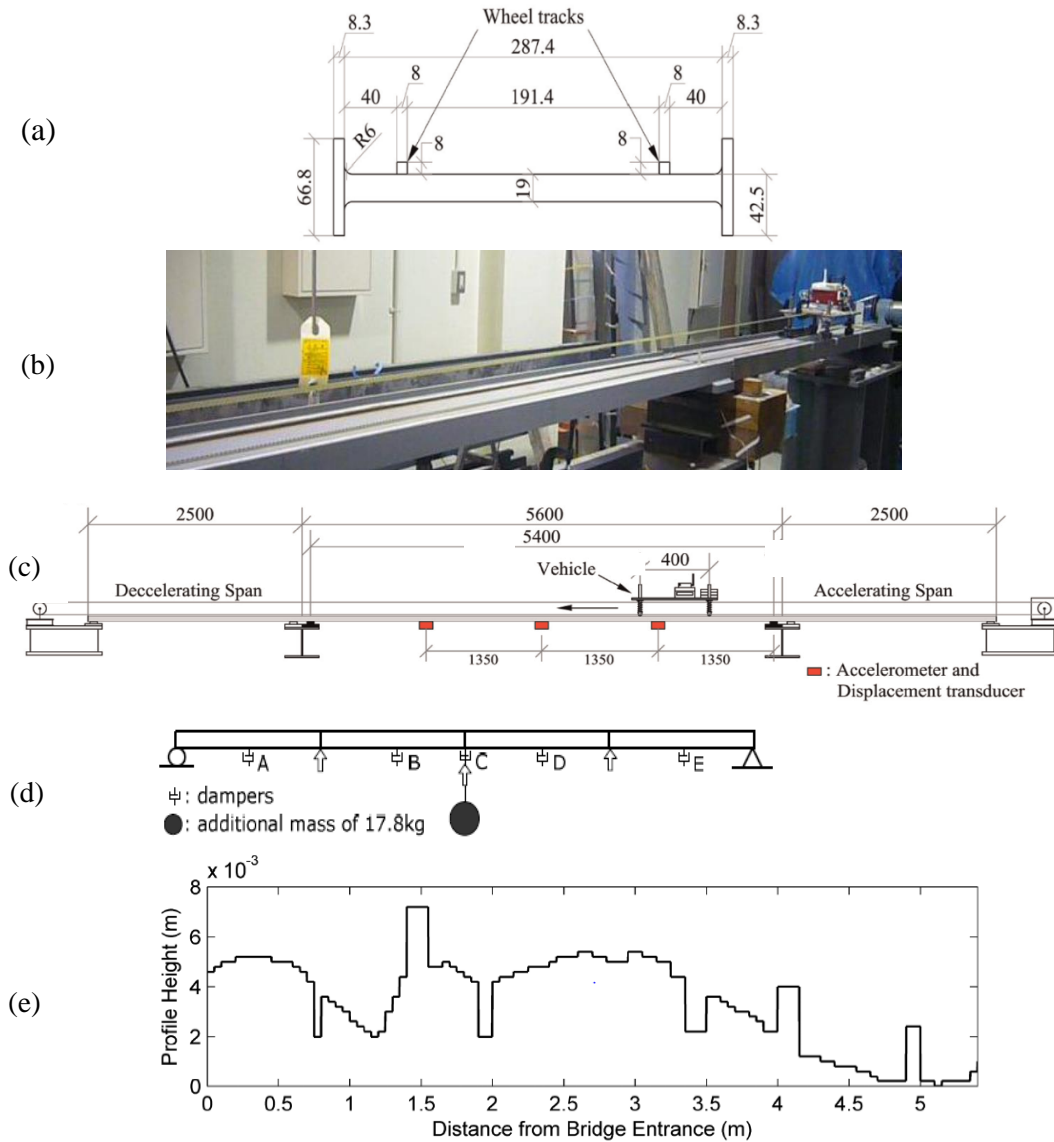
Experimental bridge: (a) beam cross section (unit: mm), (b) elevation of set-up, (c) laboratory set-up (unit: mm), (d) experimental setup for changing damping ratio, (e) experimental road profile.
